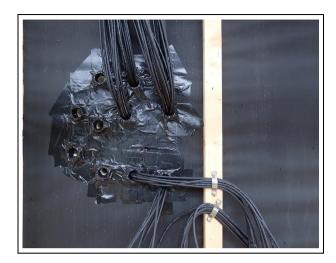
Substantial use of tape to create a seal around photovoltaic electricity cables penetrating the wind barrier.
